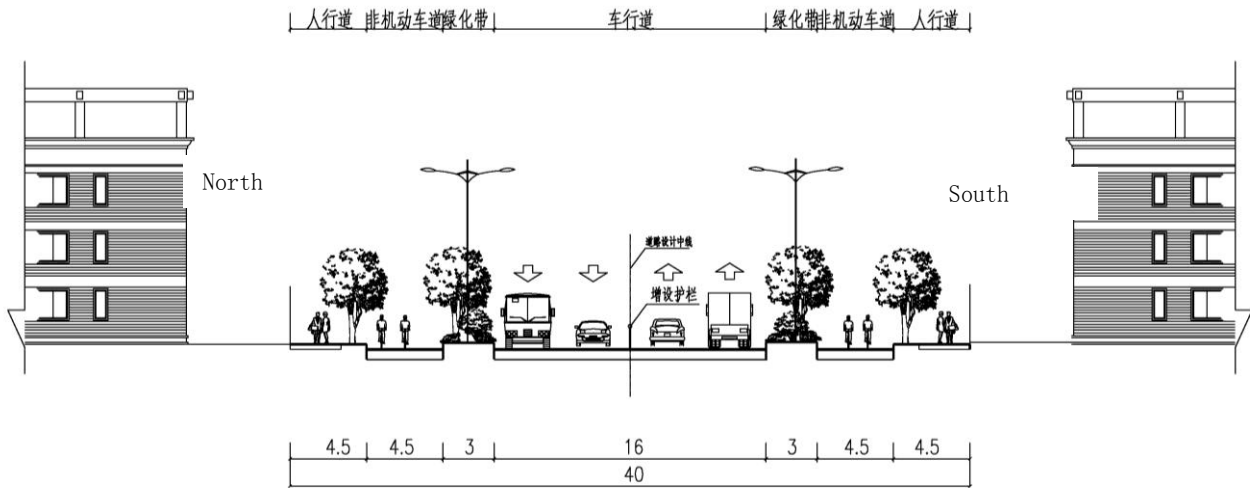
Sectional View for Reconstruction of Biyun Road (Jinqiu Avenue ~ New G316)
